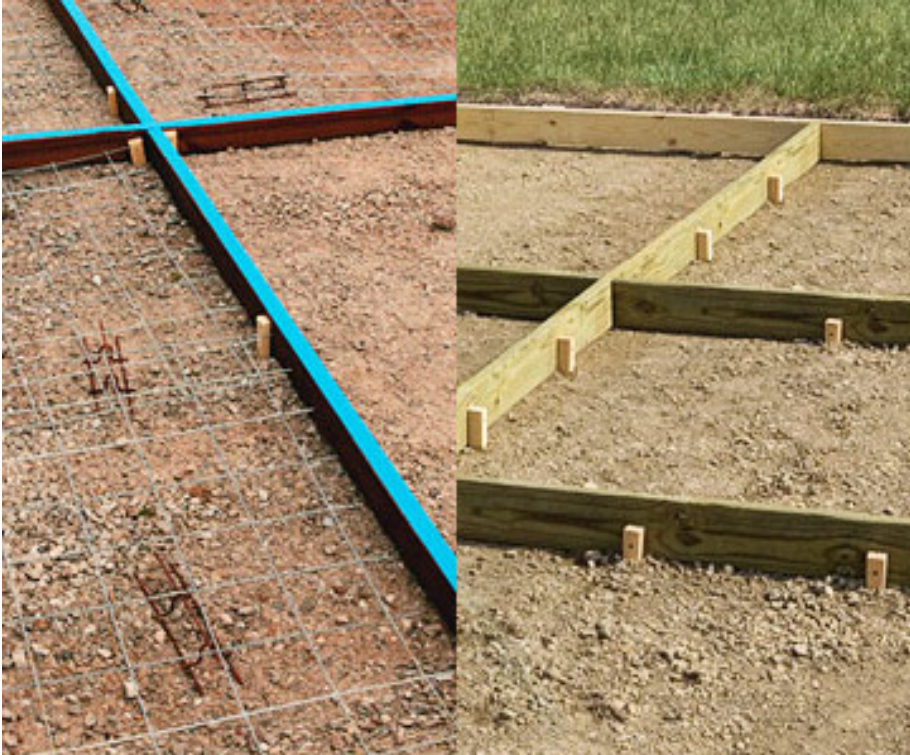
Multiple sections of staked siding boards before concrete has been poured (Better Homes & Gardens, n.d.)
